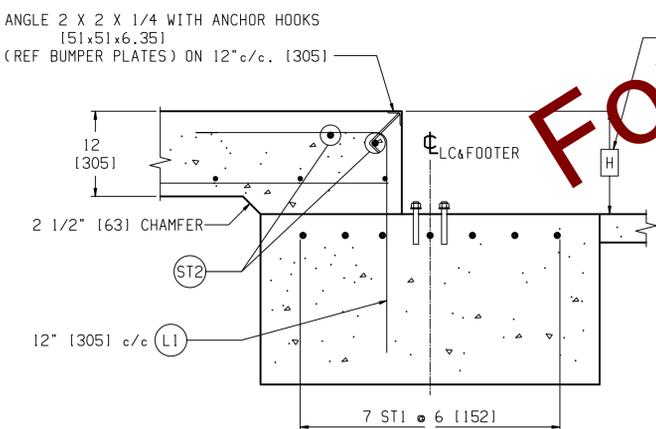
DETAIL "L" ANCHOR LOCATIONS (OTHER SIDE IS OPPOSITE)
